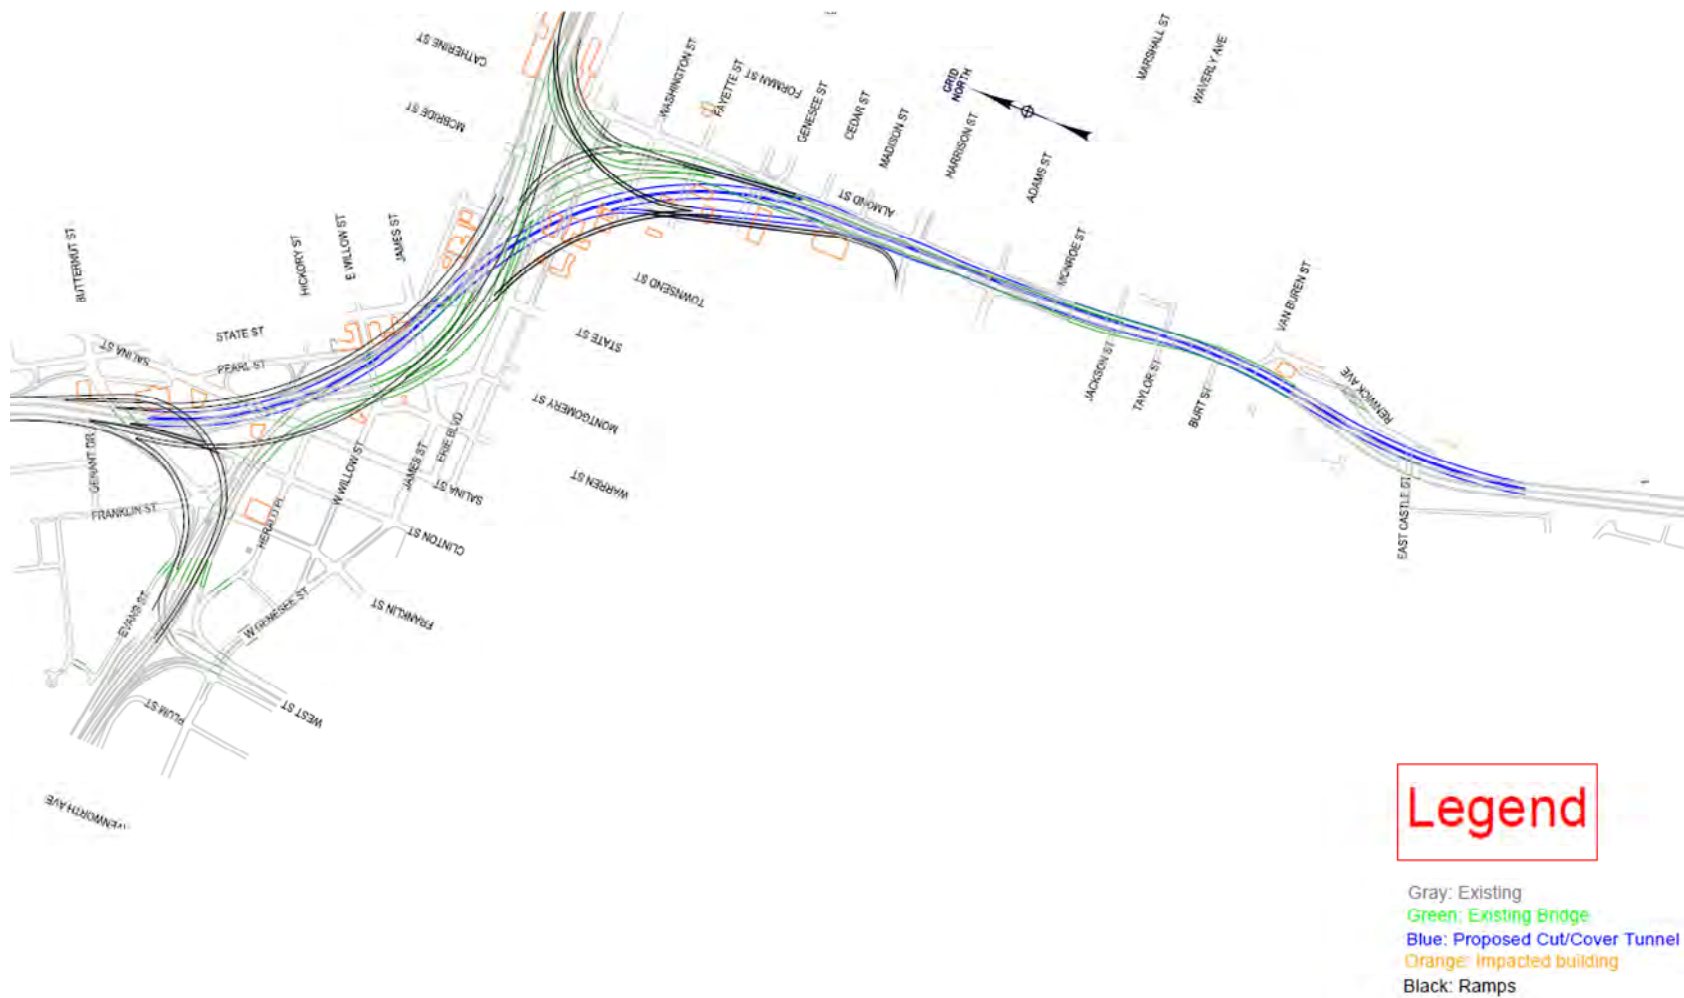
Concept T-5: Cut and Cover Tunnel Main Alignment and Connecting Ramps – Plan View
